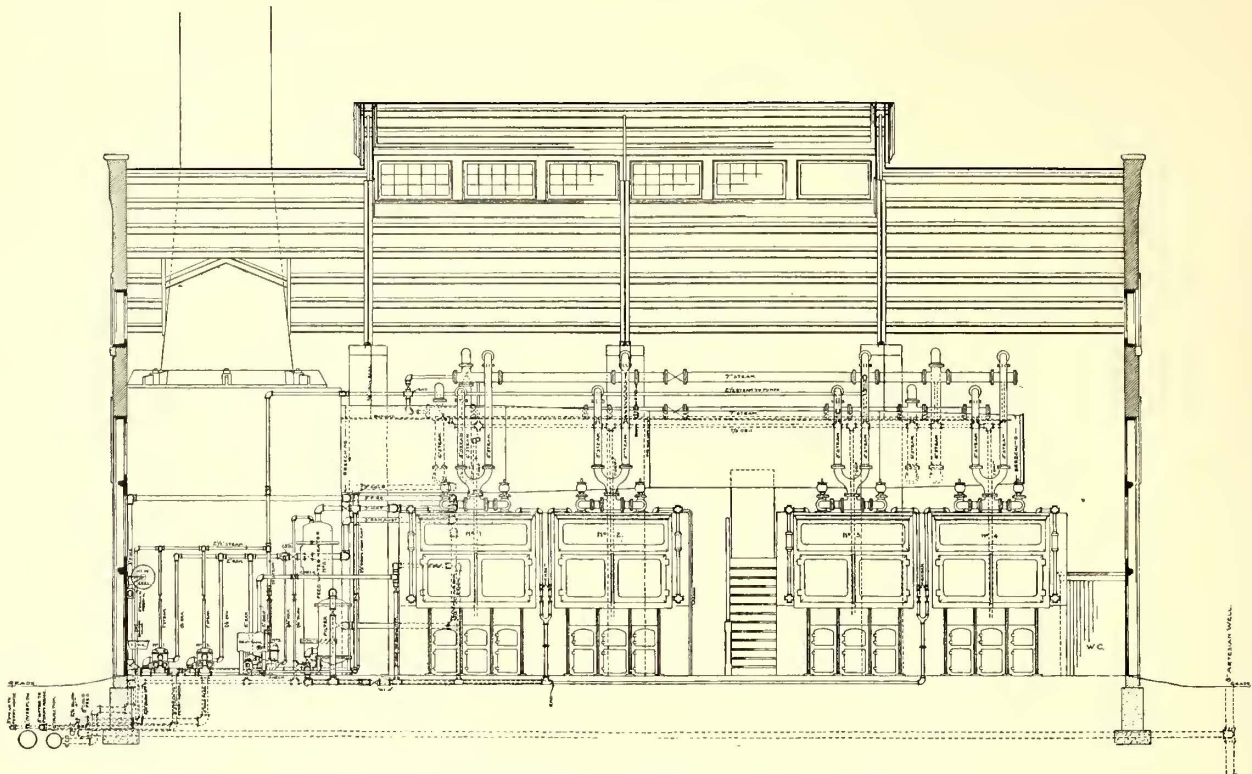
ELEVATION OF PIPING IN BOILER ROOM.
